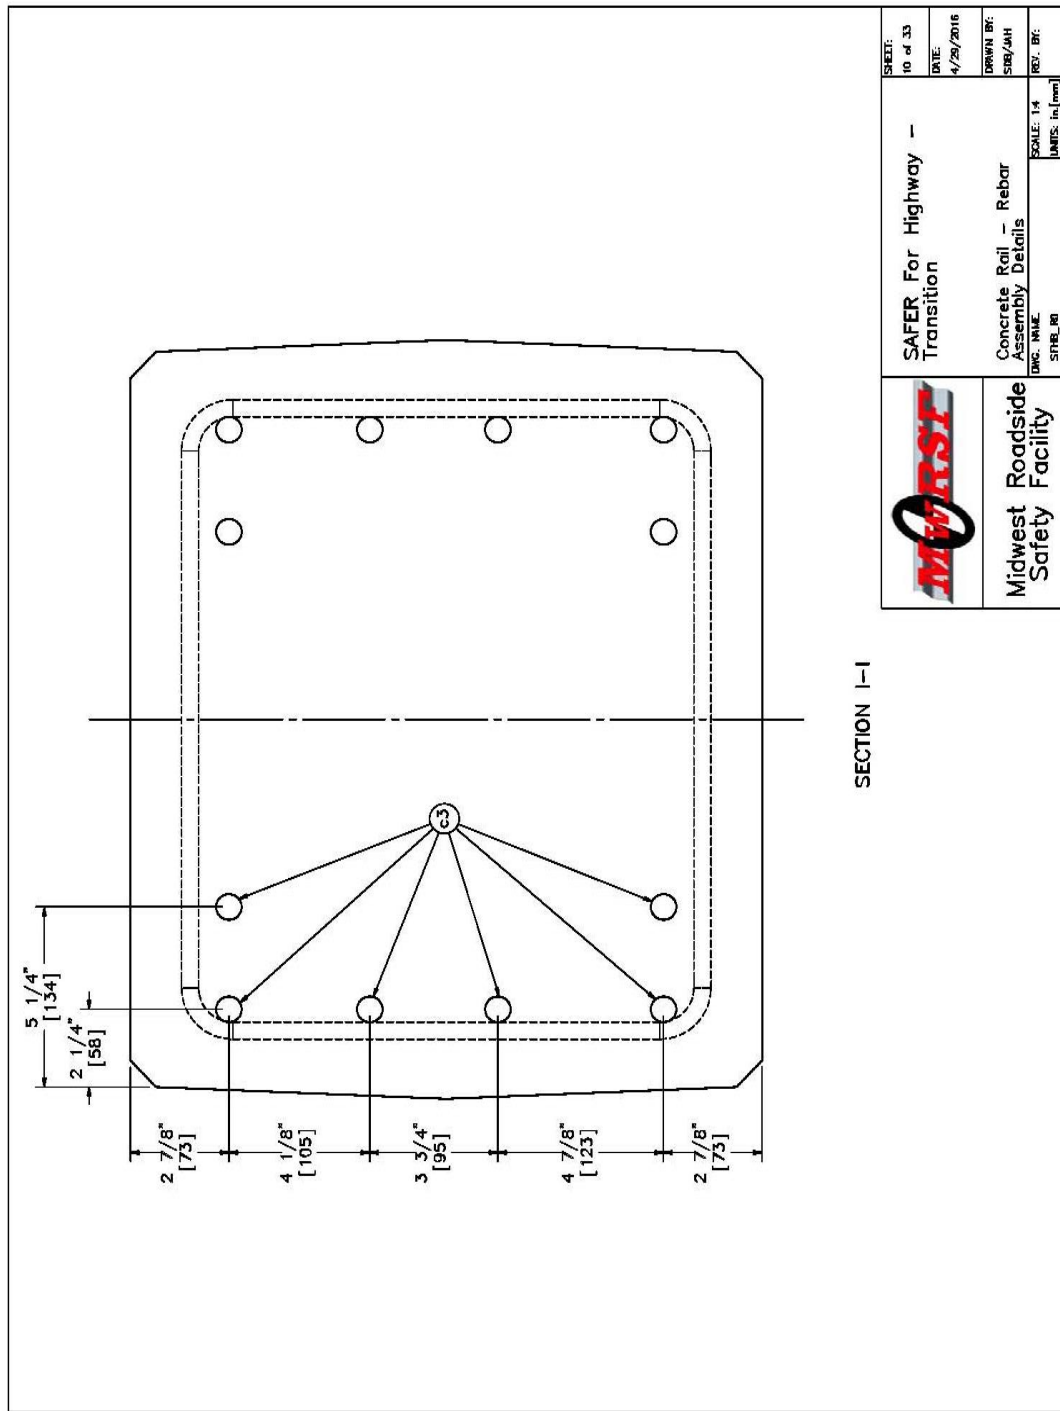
Concrete Rail Rebar Assembly Details, RESTORE Barrier Transition
